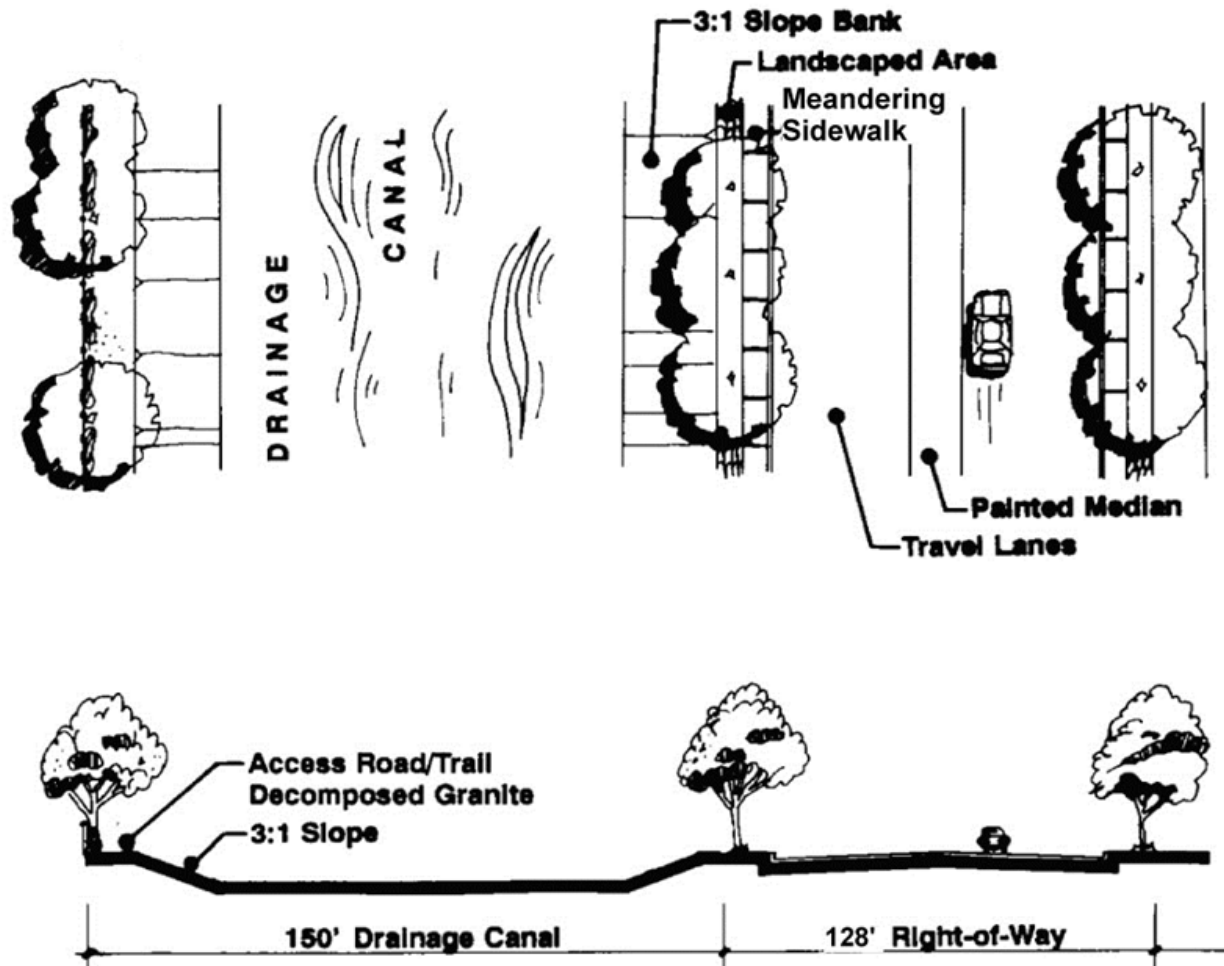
, Arterial Streetscape 2, Polk Streetscape 2B depicts the project edge where the drainage facilities abut Polk Street.
